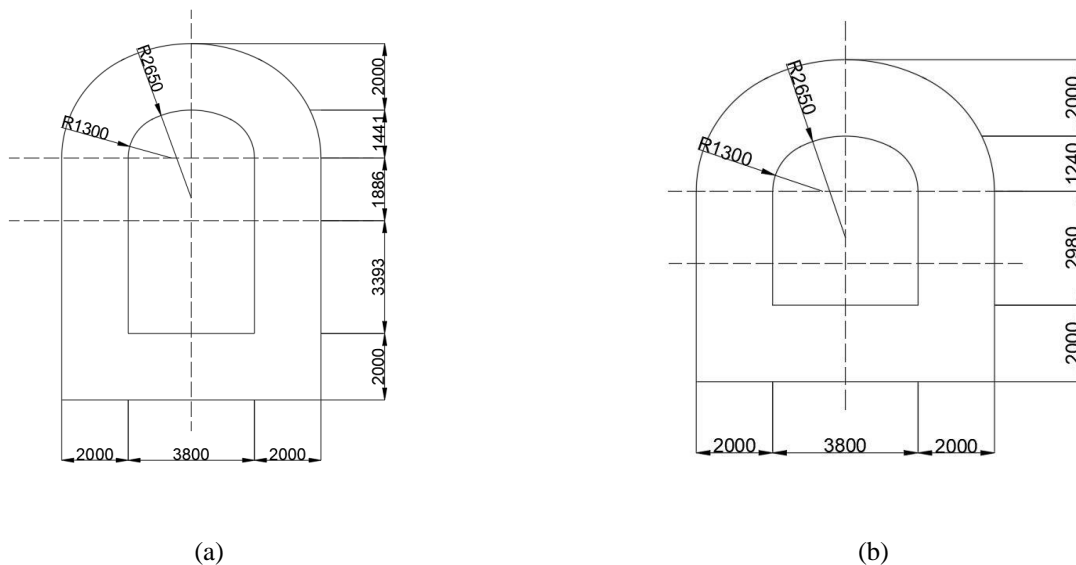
Dimensions of the frozen soil wall (unit: mm): (a) large section (b) small section.
